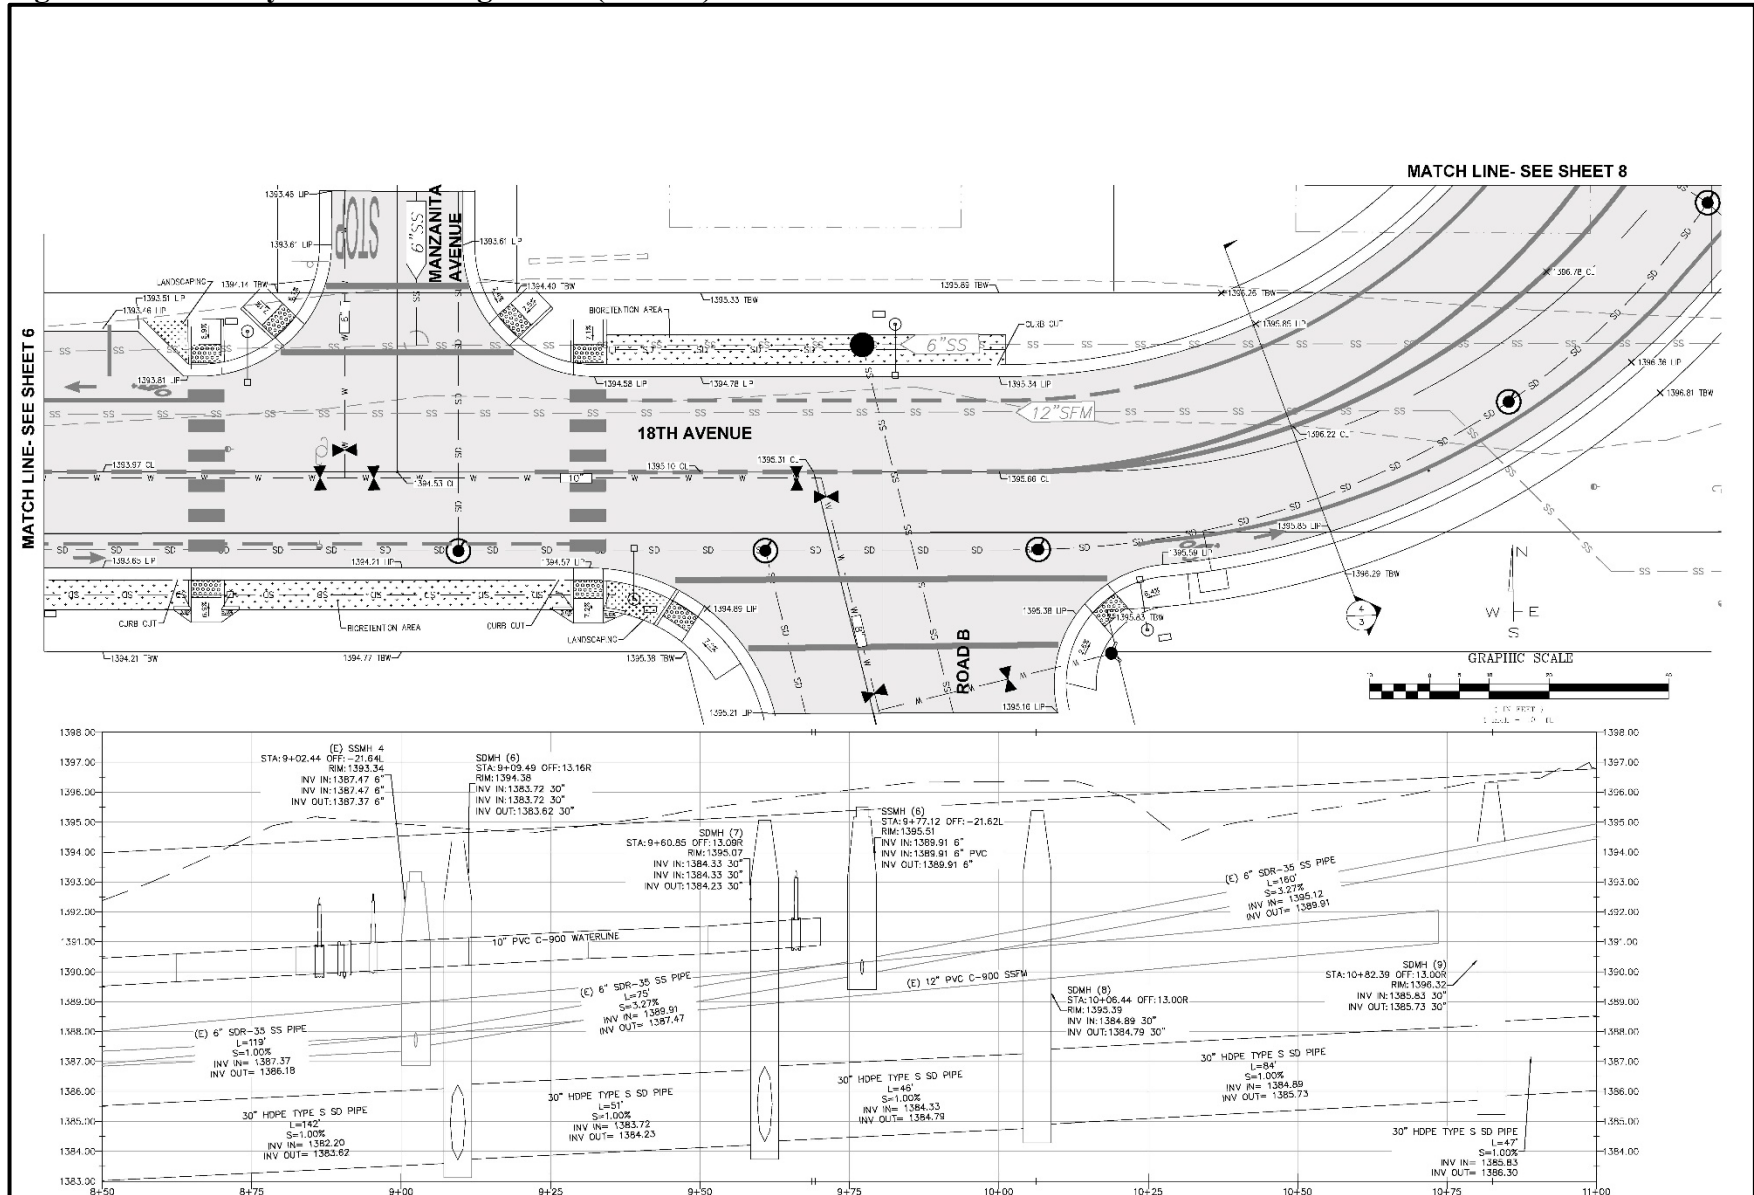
Roadway Site Plan – Segment 5 (Sheet 8)
